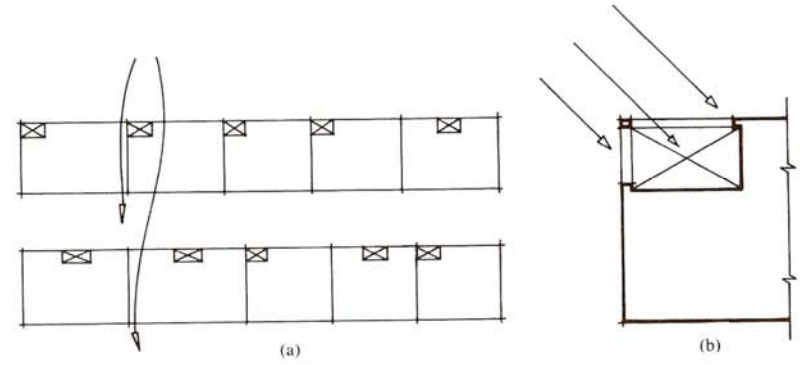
Plan for two rows of houses showing the *malqaf* or wind catch of each arranged to bring wind to the dwelling (a), and details of a *malqaf* (b). (See p. 43.)
